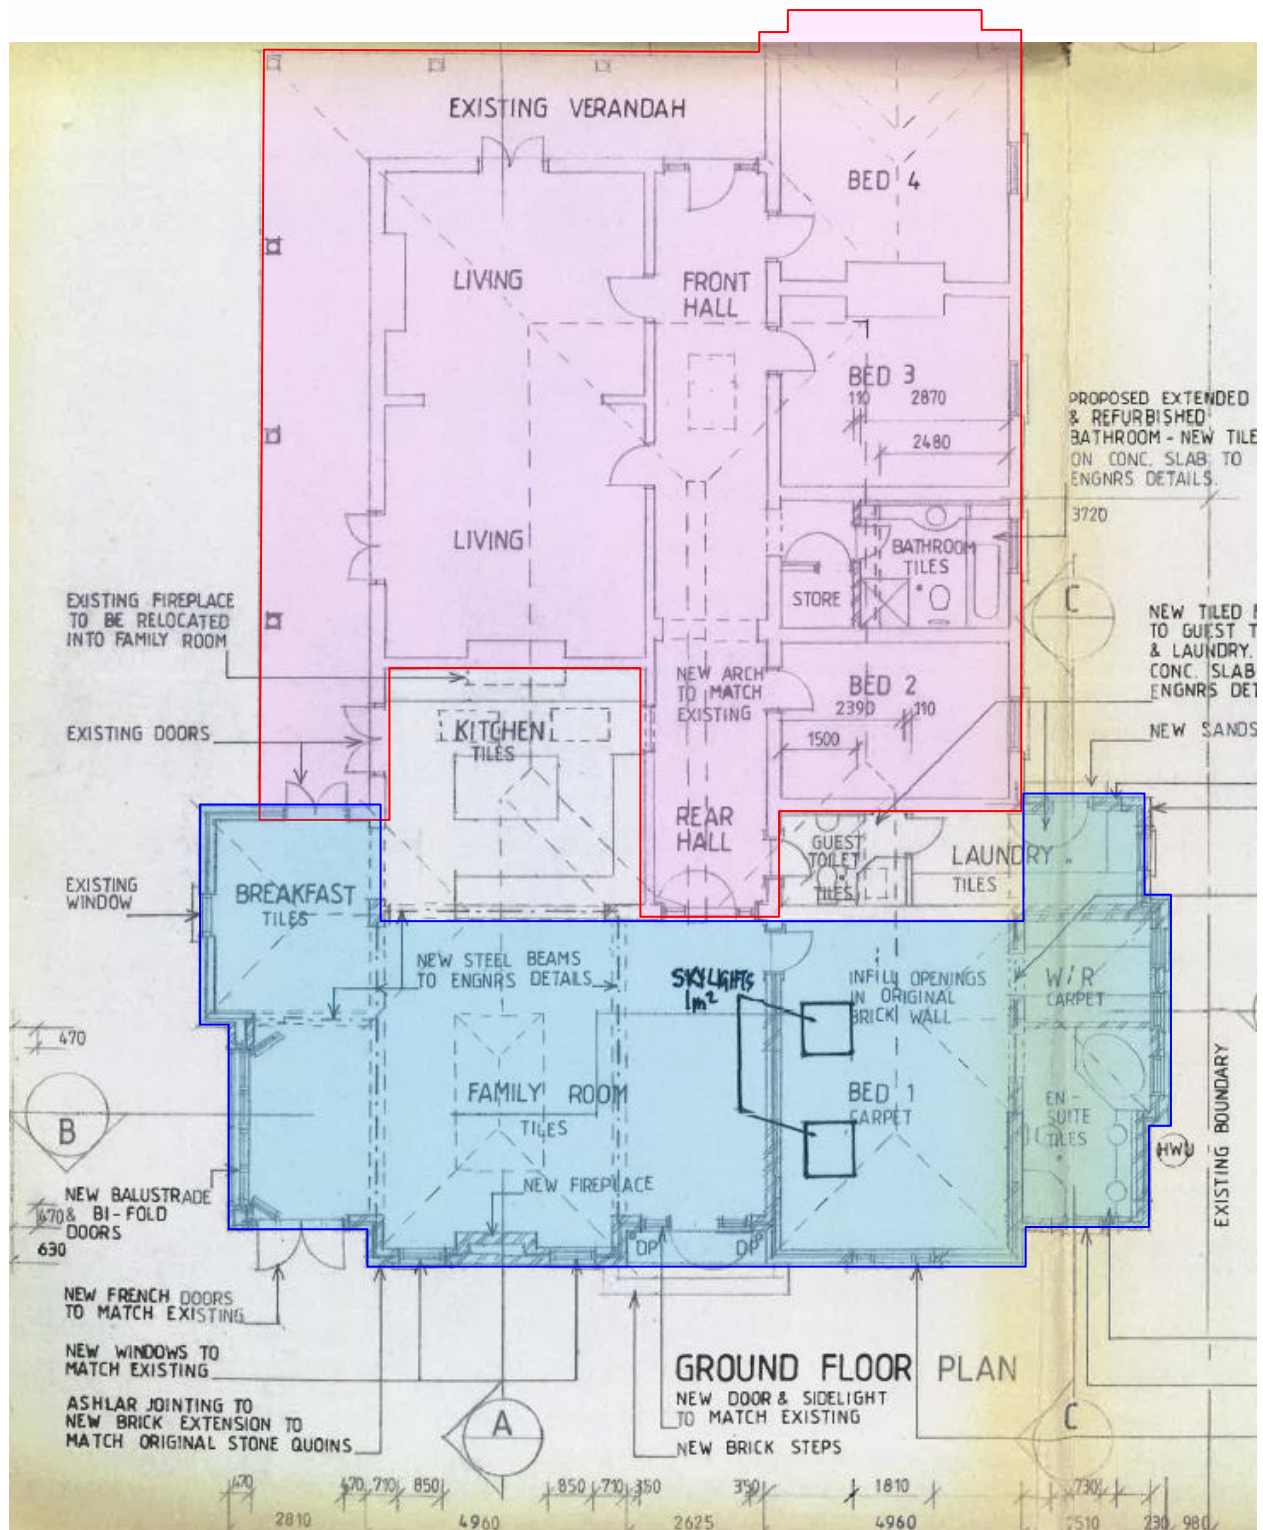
Ground Floor Plan of sympathetic additions designed by Otto Cserhalmi & Partners P/L in BA 257/94
